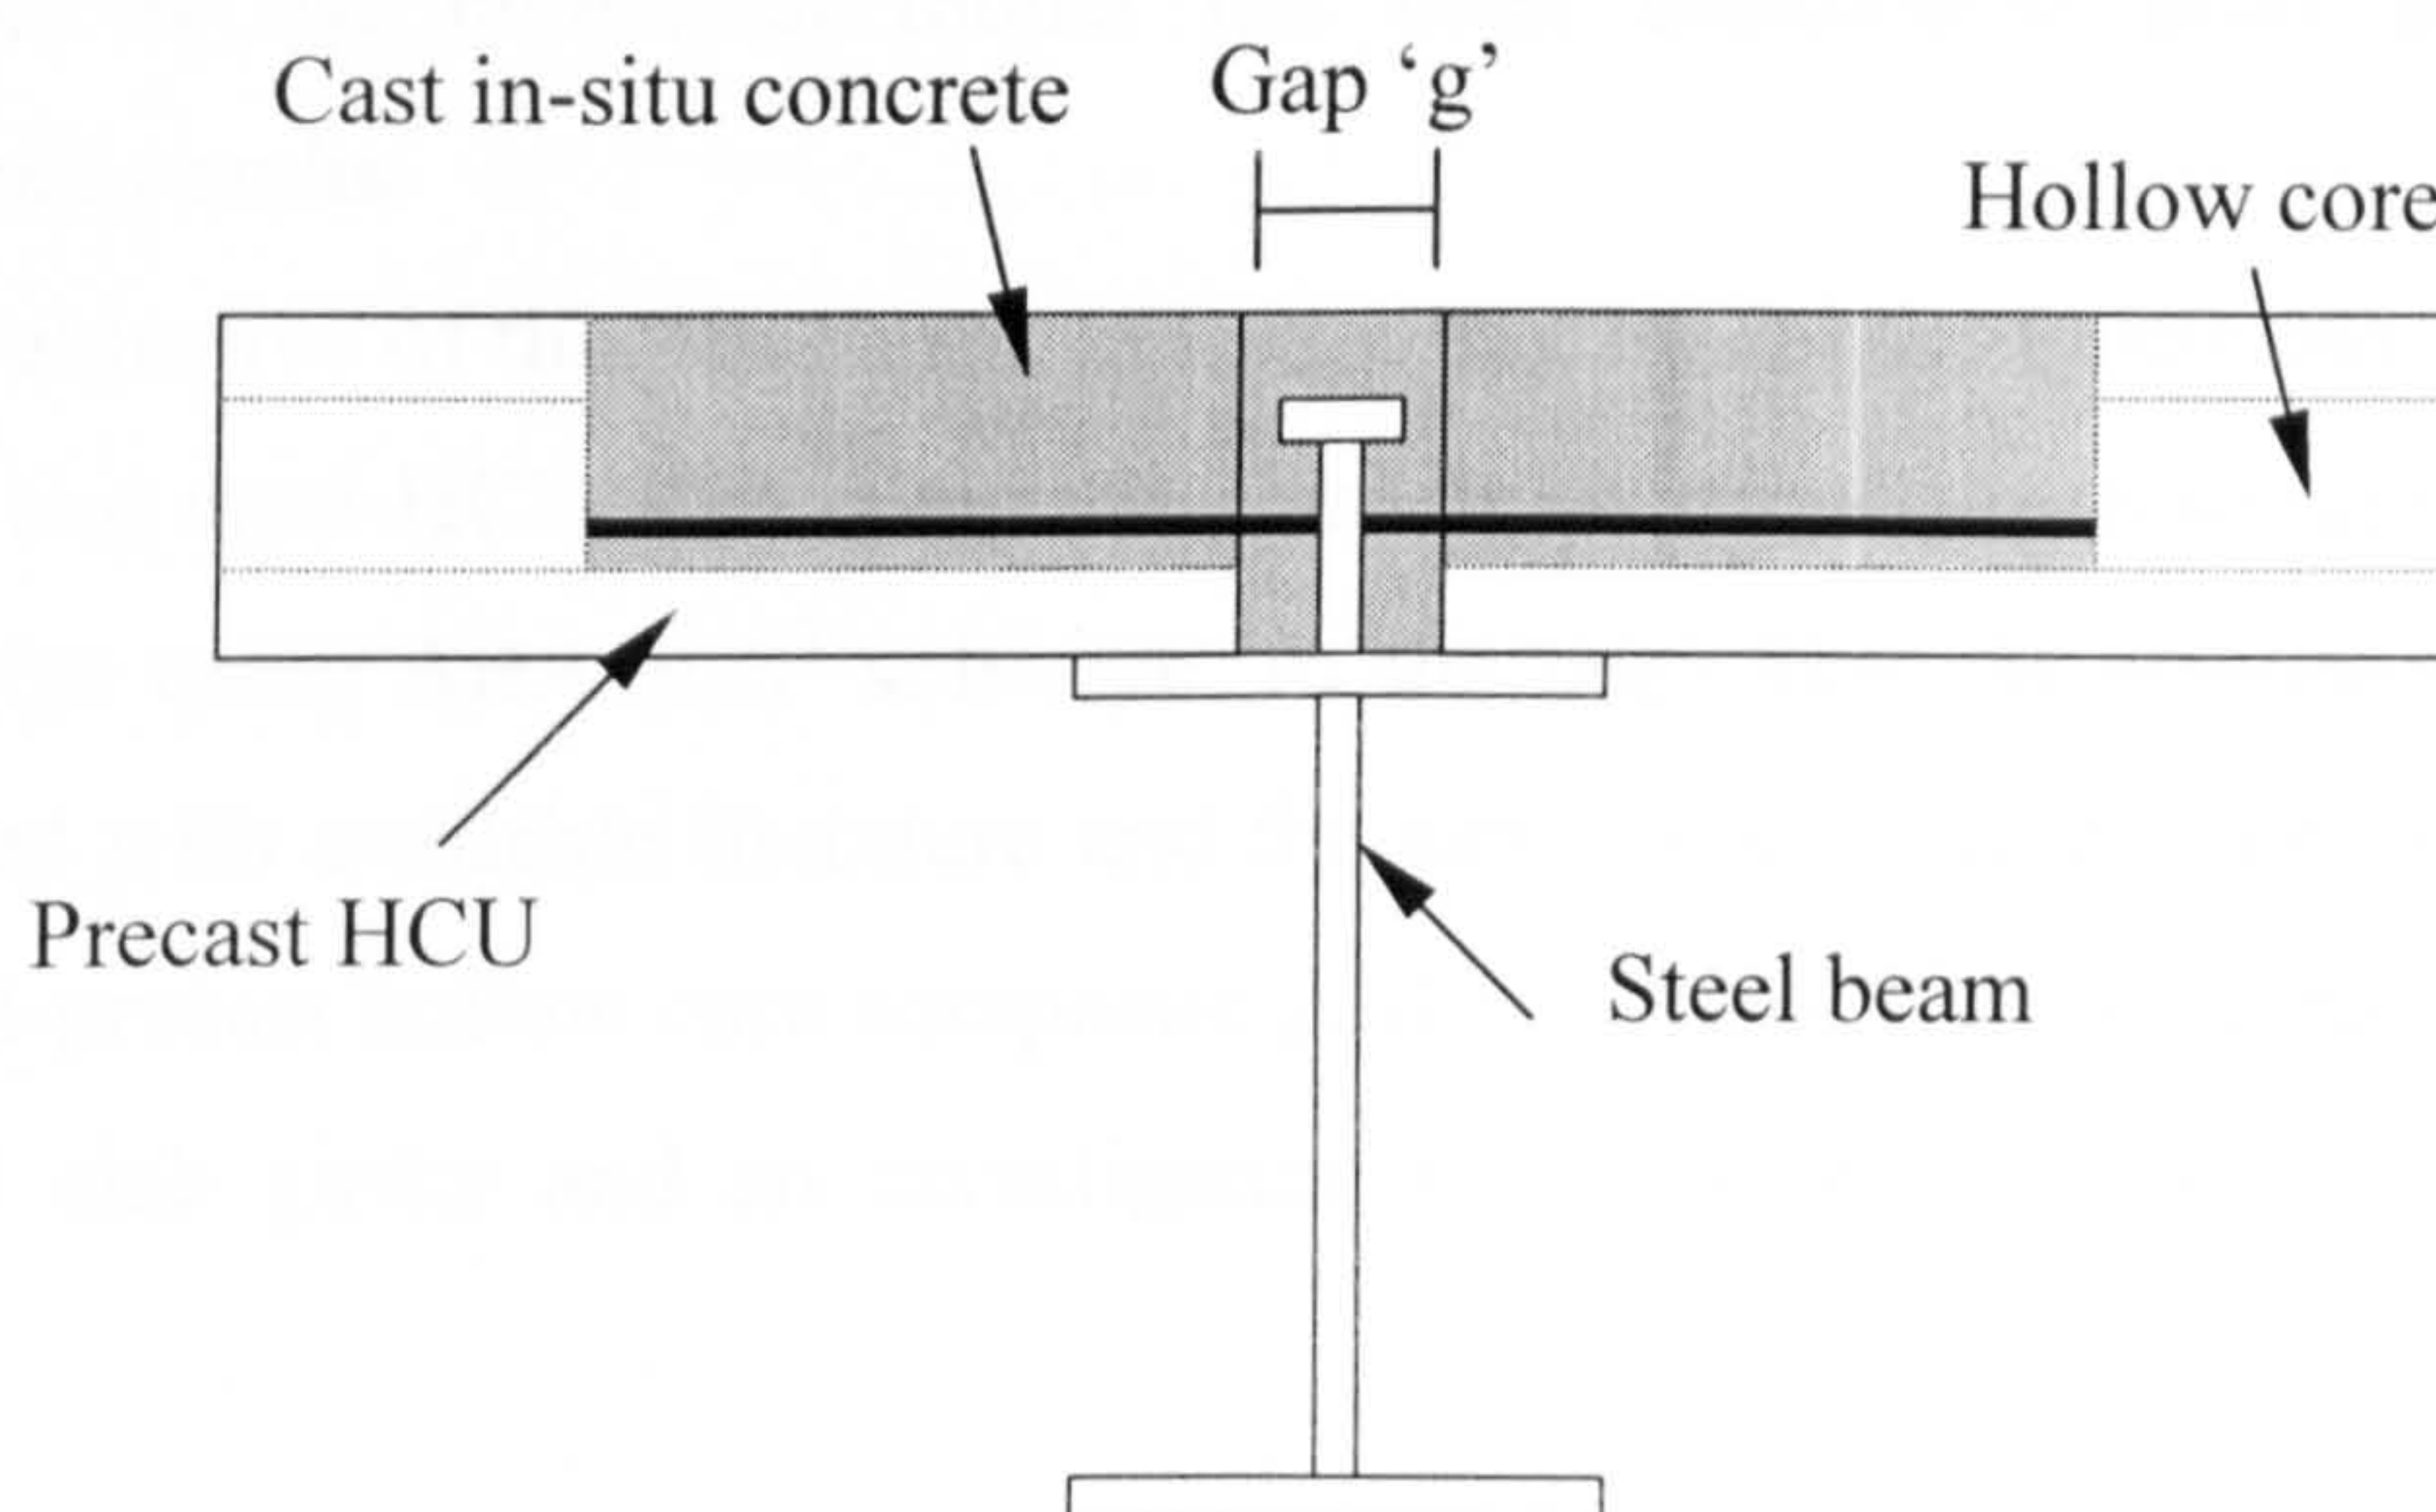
b Cross section A-A through steel-precast HCU slab composite girder
